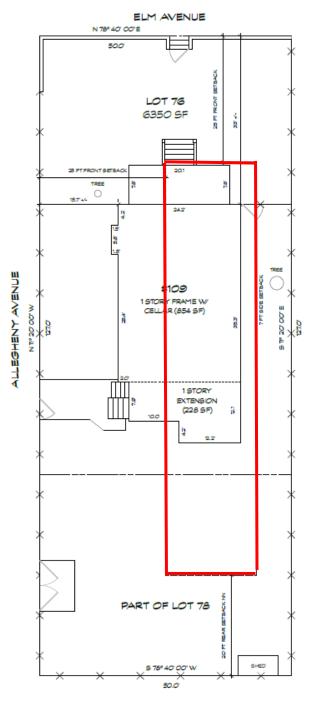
Existing site plan, with the buildable envelope outlined in red.
